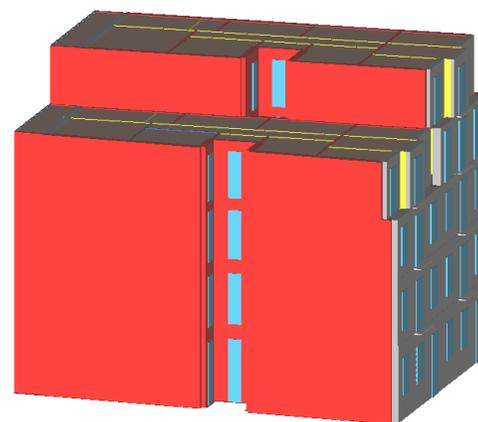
3muri Model of the building Travessa Santa Marta nº4.
